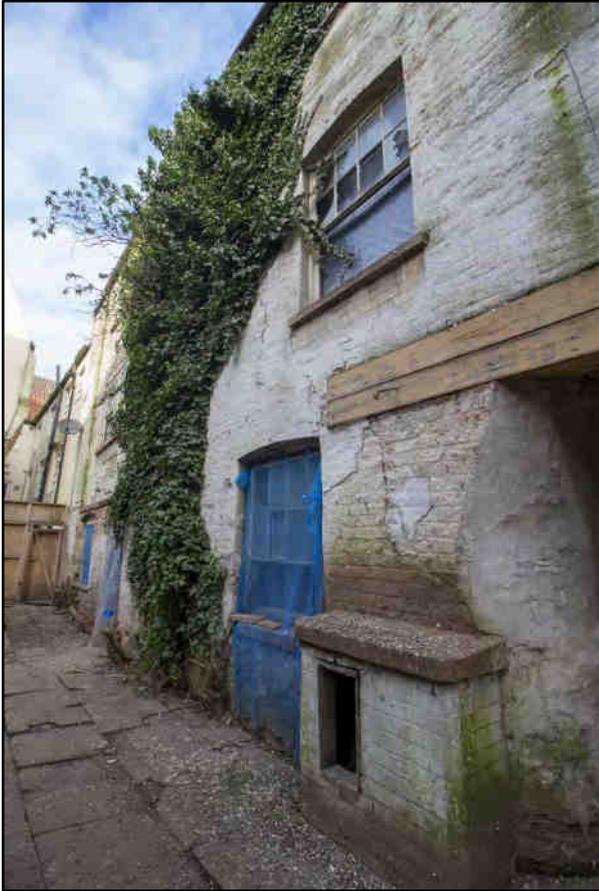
South-west facing elevation and courtyard looking towards alleyway to Nene Quay
